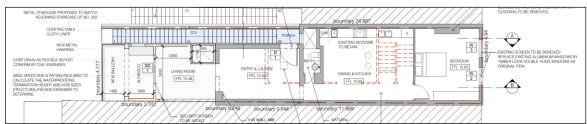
Proposed first floor plan (source: Vivi building design, dated 13/12/2024)
